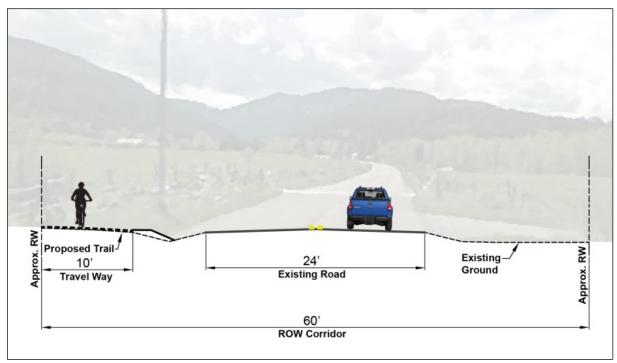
Typical section along Hyalite Canyon Road looking south
